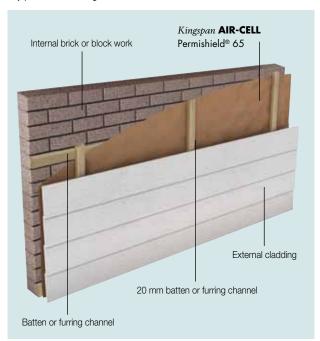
Kingspan AIR-CELL Permishield® 65 in reverse brick veneer wall installation
